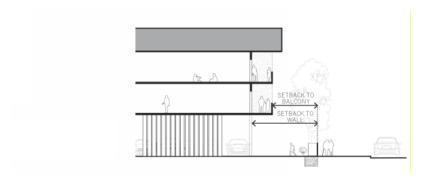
5 -front boundary setback to balcony and wall
